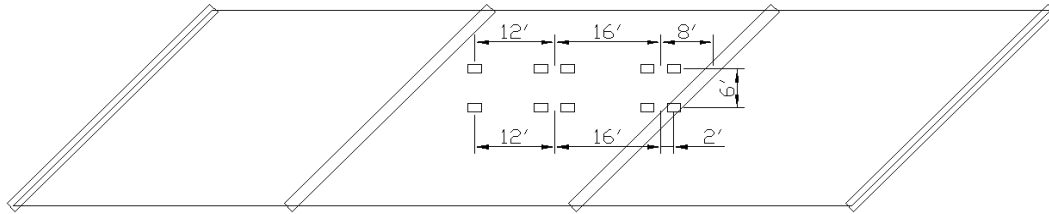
Plan of bridge deck with Illinois legal load Type 3-S2.
